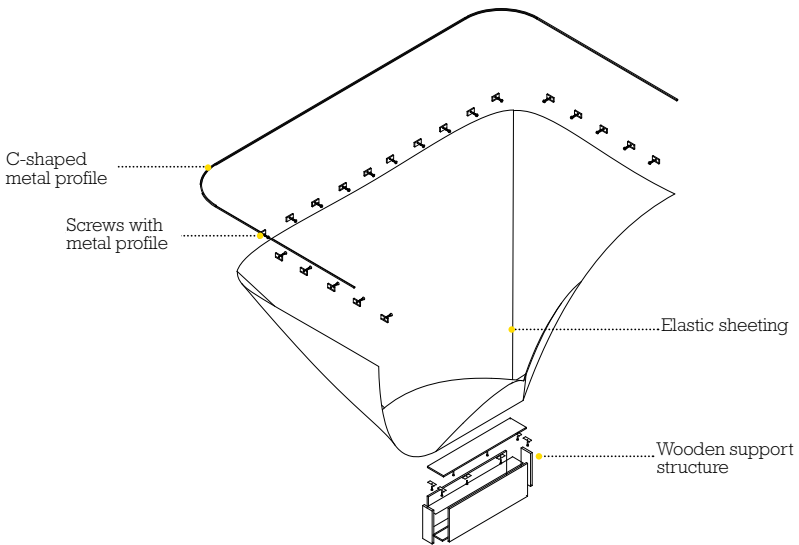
Construction detail - Main components of the central outfitting element | Axonometric exploded view.
